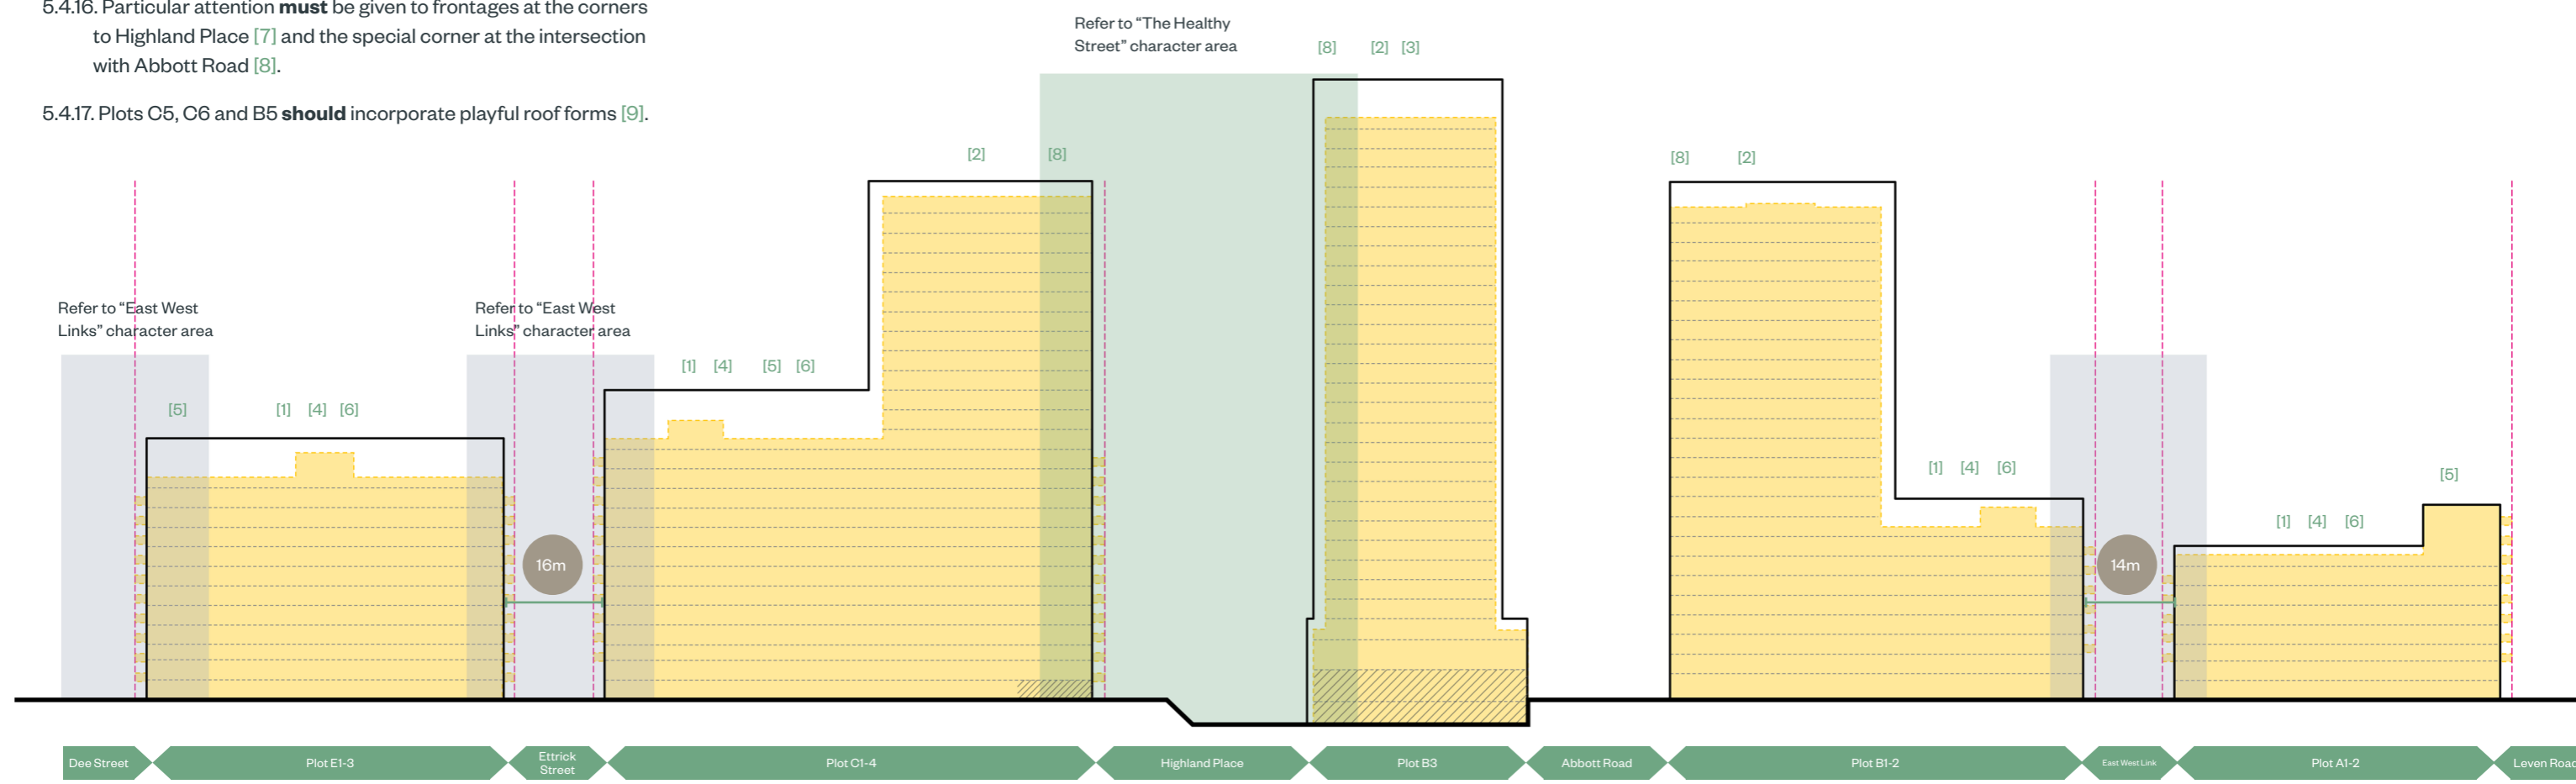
Illustrative elevation AA - Enterprise Yard looking east
